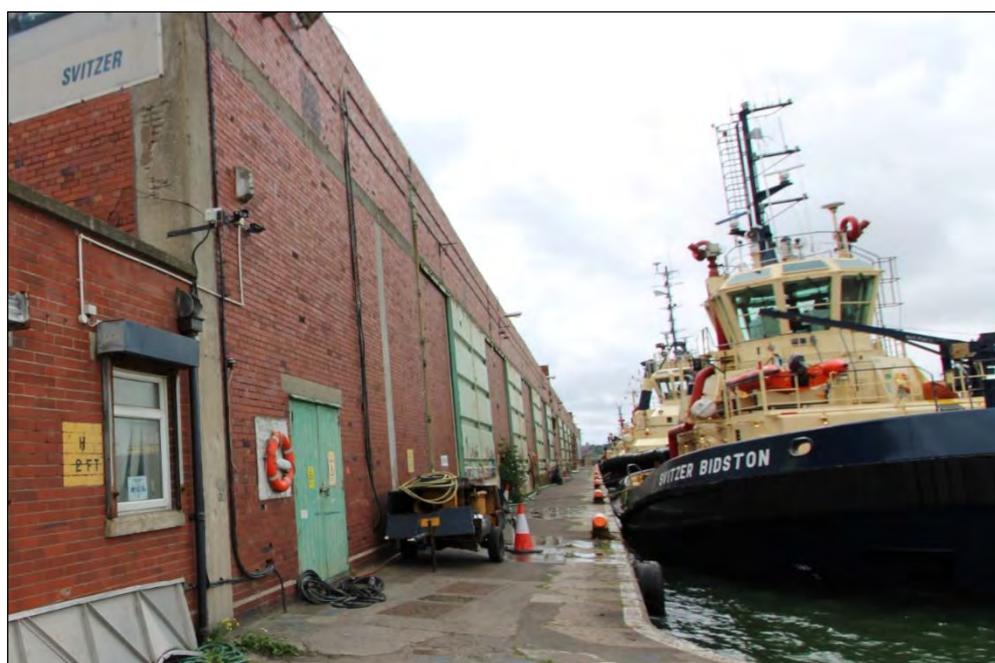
Northern elevation, facing west, with double pedestrian doors to the left of frame
